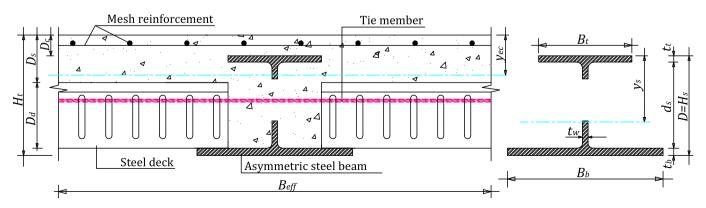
Geometrical configuration of shallow cellular beam with shear connection arrangement.
